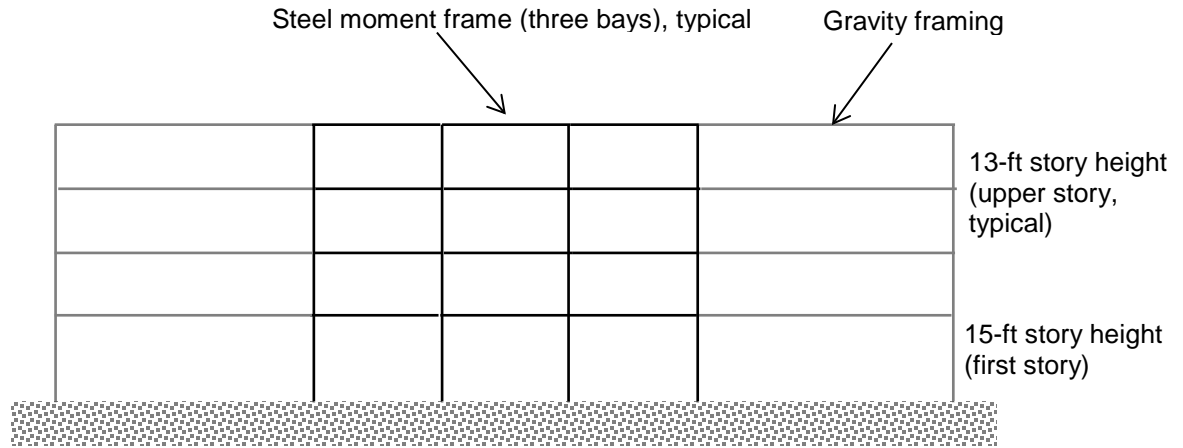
Type I archetypical building elevation view of structural framing in longitudinal direction (4-story building shown)
